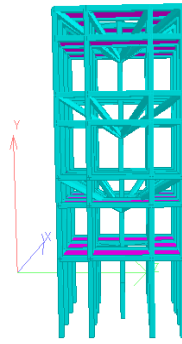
General G+3 storey building is analysed containing a central column that resembles a tree
